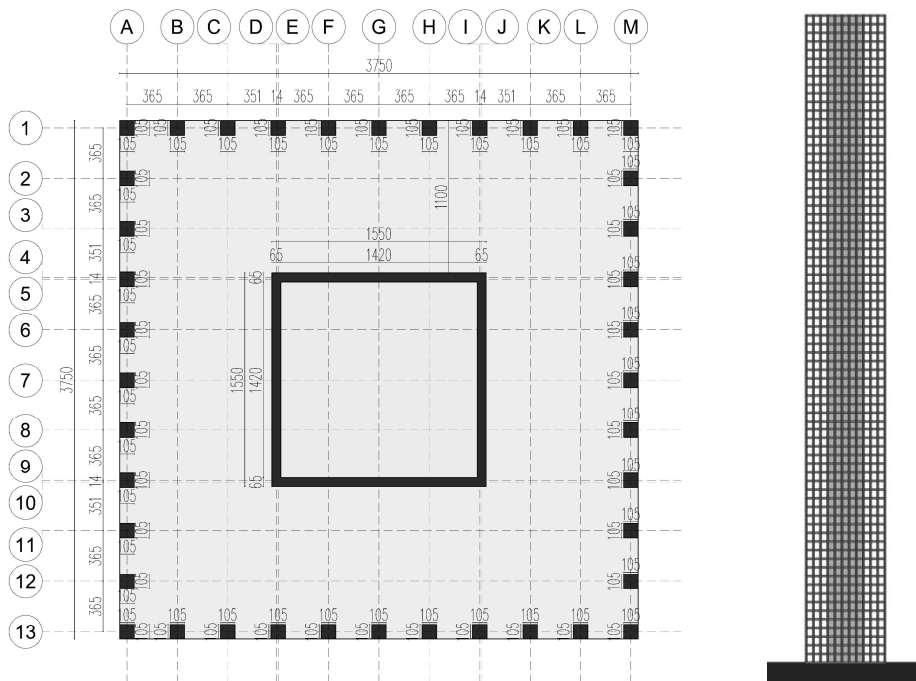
Typical floor plan and elevation of model FT_OPT_3
